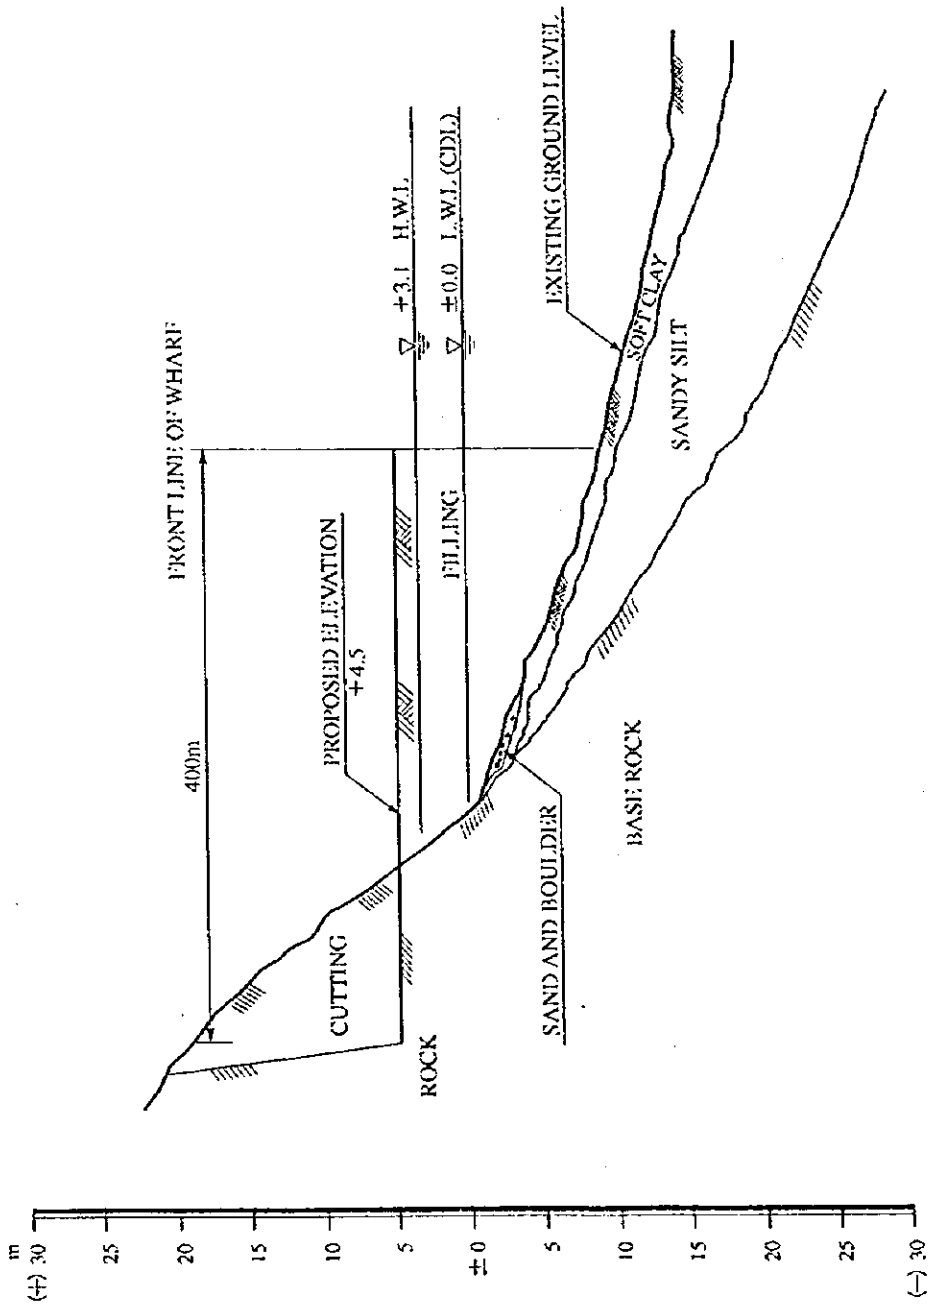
Typical Cross Section of Proposed Yard Behind The Wharf (site C-3)
